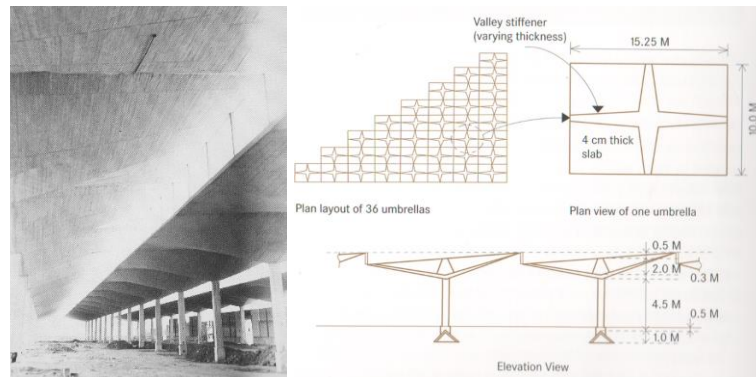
Plan and section drawings of Rio's Warehouse with tilted umbrellas (Garlock & Billington, 2008)
